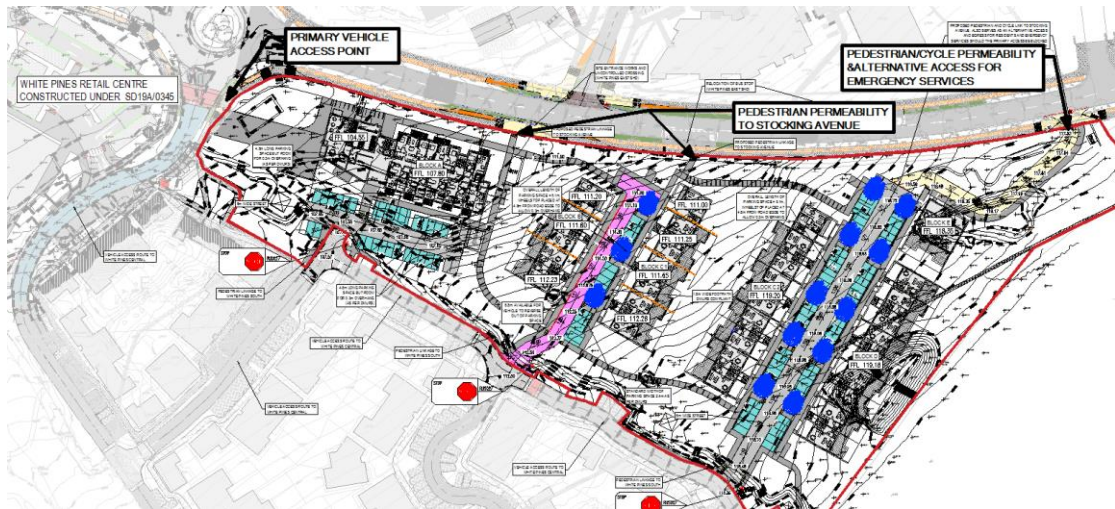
Proposed Access Points (Extract from Drawing 190004-DBFL-RD-SP-DR-C-1001)
